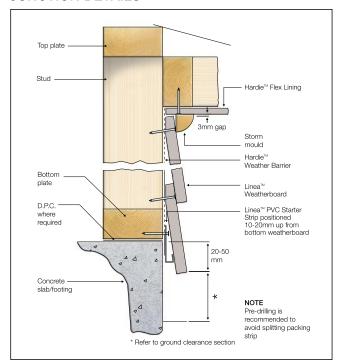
SLAB/EAVE JUNCTION DETAIL
